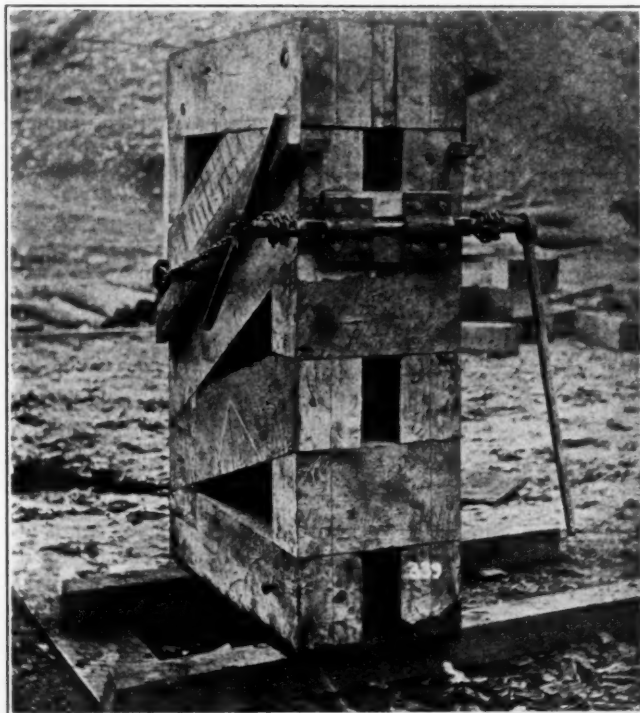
CRIB TYPE OF ROOF-CONTROL MACHINE—FRONT VIEW
